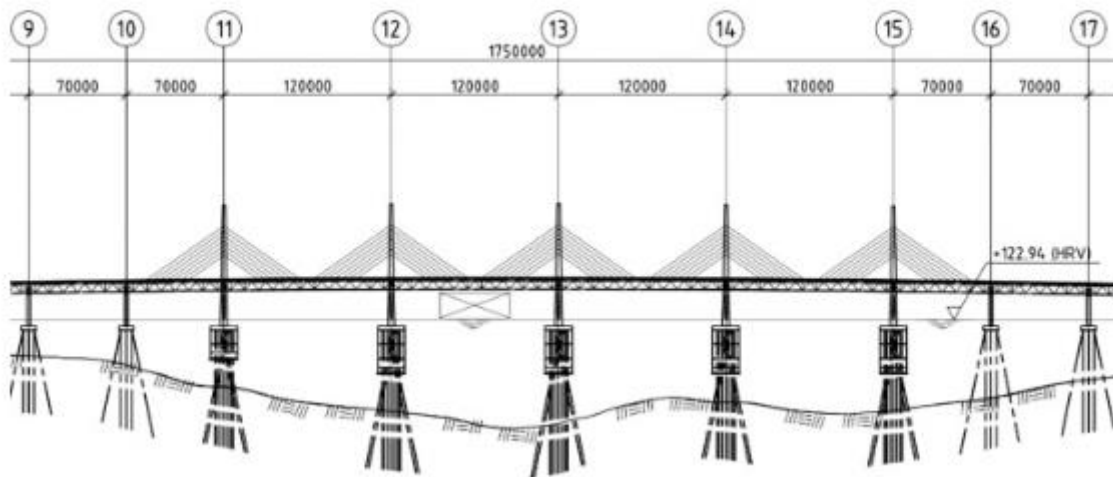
Dimensions for timber bridge design for Mjøsa bridge [71]
